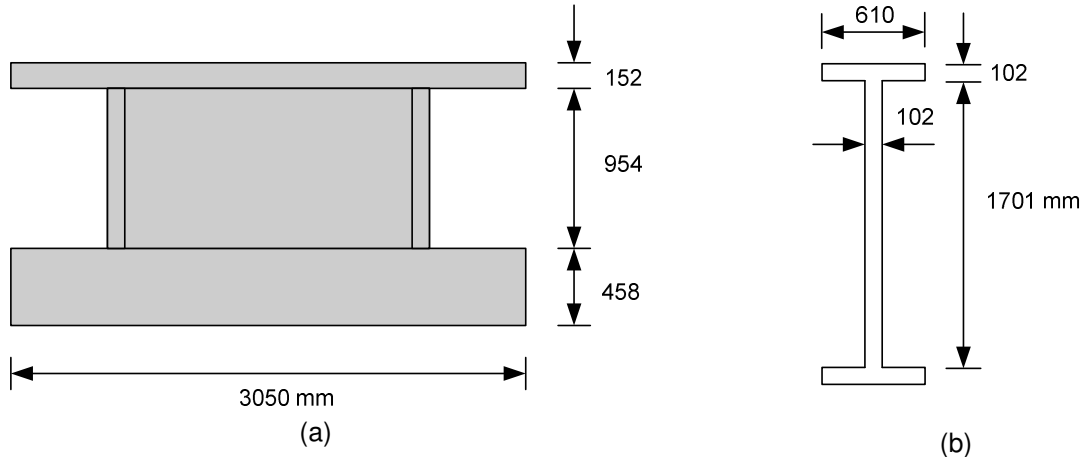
Details of Wall B1-1: (a) dimensional details; (b) sectional details.
